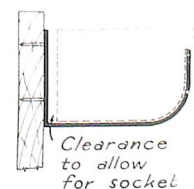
DETAIL OF "FIBROLITE" EAVES GUTTER JOINT.
